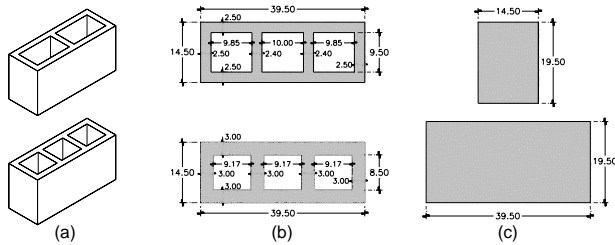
Masonry concrete block used in the State of Campeche, dimensions in cm, (a) isometric of two and three cells, (b) plan dimensions and (c) lateral dimensions
